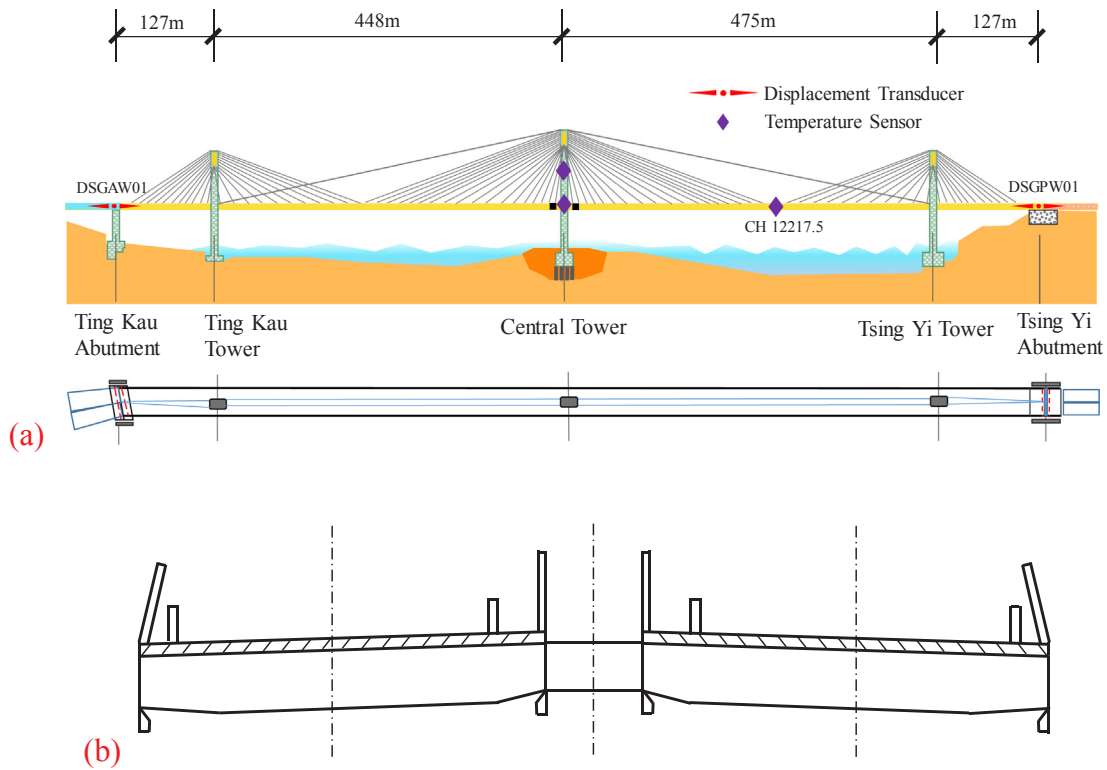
Ting Kau Bridge: (a) elevation; (b) deck cross-section.
